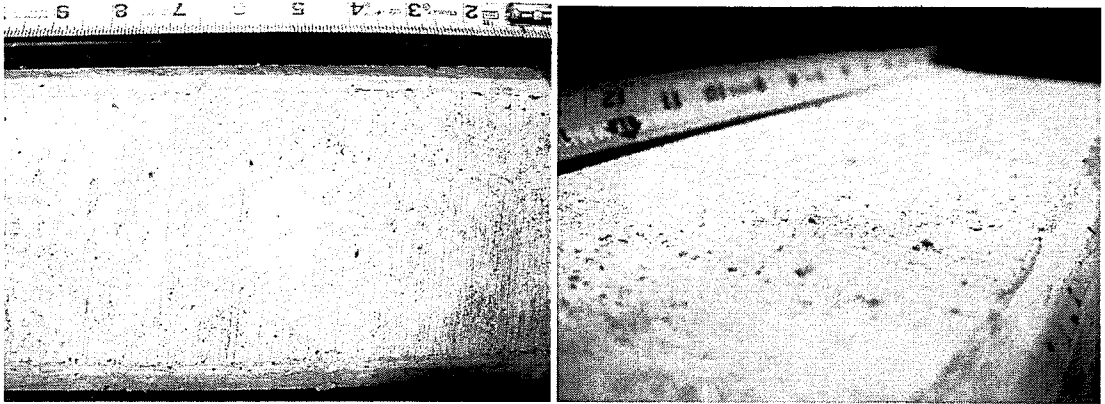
Broom Surface Finish [Specimen 6B6]
